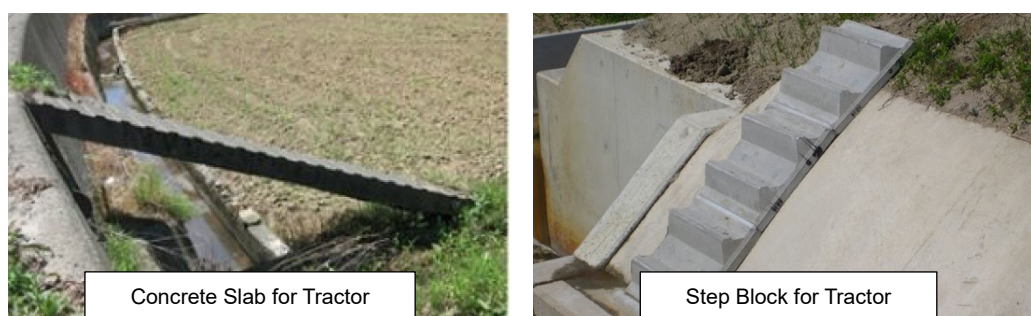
Concrete Slab and Step Blocks for Tractor Entry into Canals
